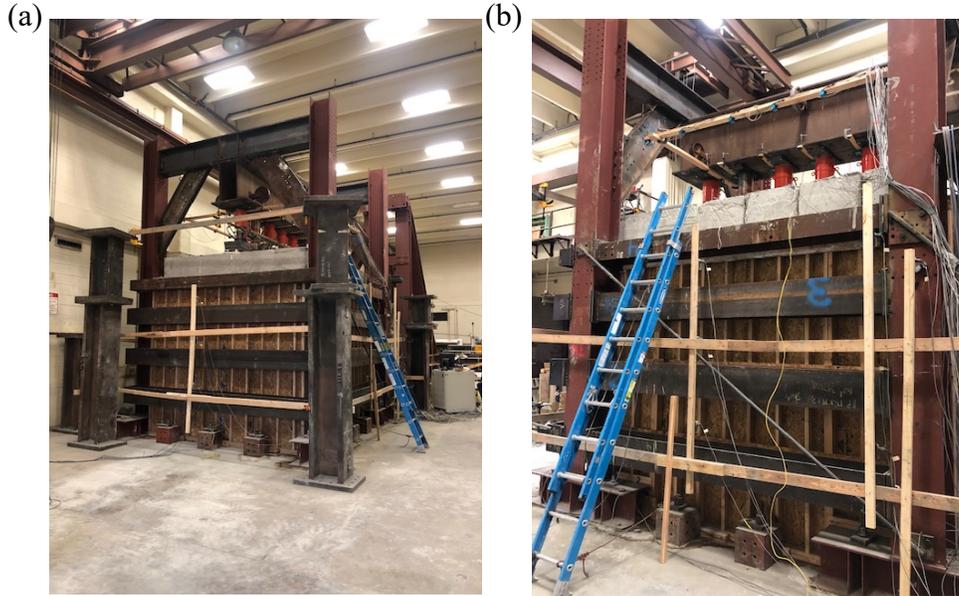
Photographs showing: (a) the test box from the short side opposite from the retaining wall and (b) the test box from the long side with the concrete surcharge blocks and hydraulic jacks reacting against a longitudinal beam consisting of two deep beams.
